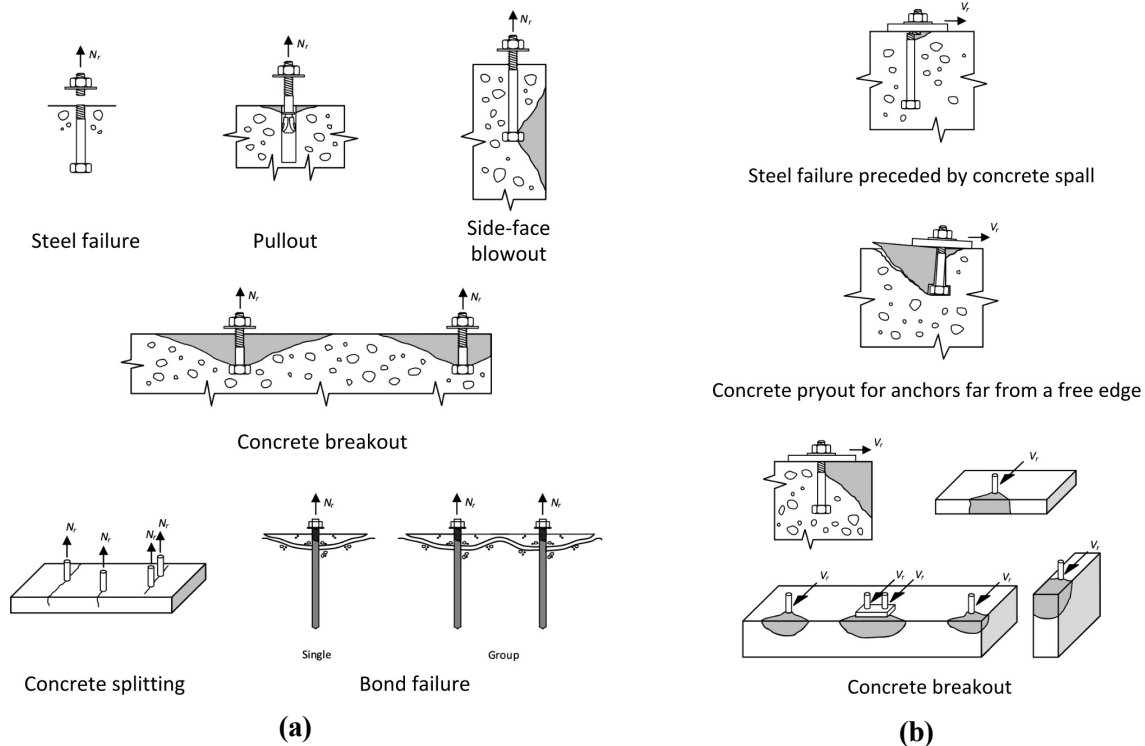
Failure modes of anchors embedded in concrete loaded in (a) tension, and (b) shear (adapted from CSA (2019))
